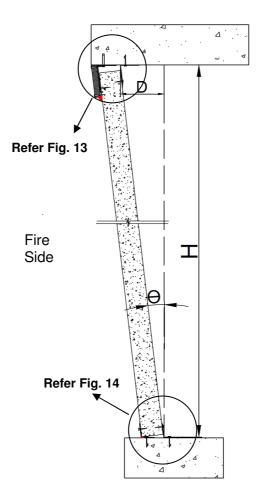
Inclined Vertical Speedpanel Panel Wall
